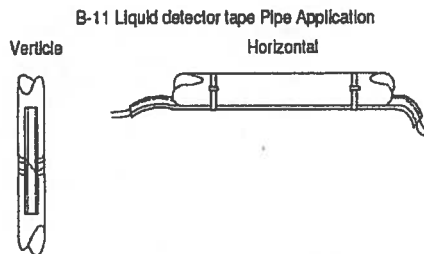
VERTICAL & HORIZONTAL PIPE LAYOUT
